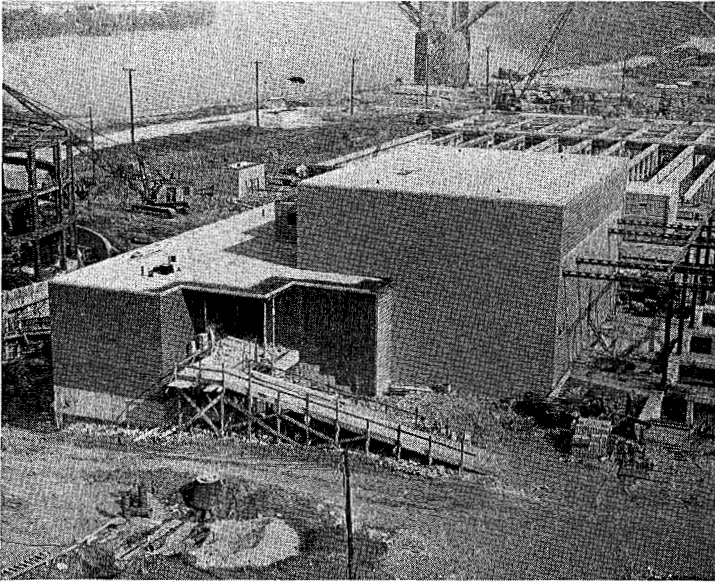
VIEW OF THE SOUTH ELEVATION OF THE RACK AND CHLORINATION BUILDING, WITH THE CHLORINATION FACILITIES LOCATED UNDER THE LOW ROOF AND WITH THE RACKS PROVIDED WITH THE HIGH ROOF. A PORTION OF THE AERATED GRIT CHAMBERS APPEARS IN THE RIGHT OF THE PHOTOGRAPH.
